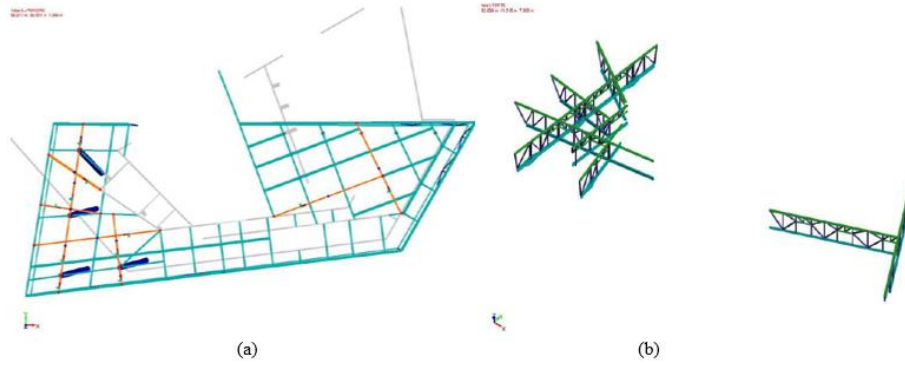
Location of lattice girders in first floor (a) and axonometric view of components of the steel frame (b).
